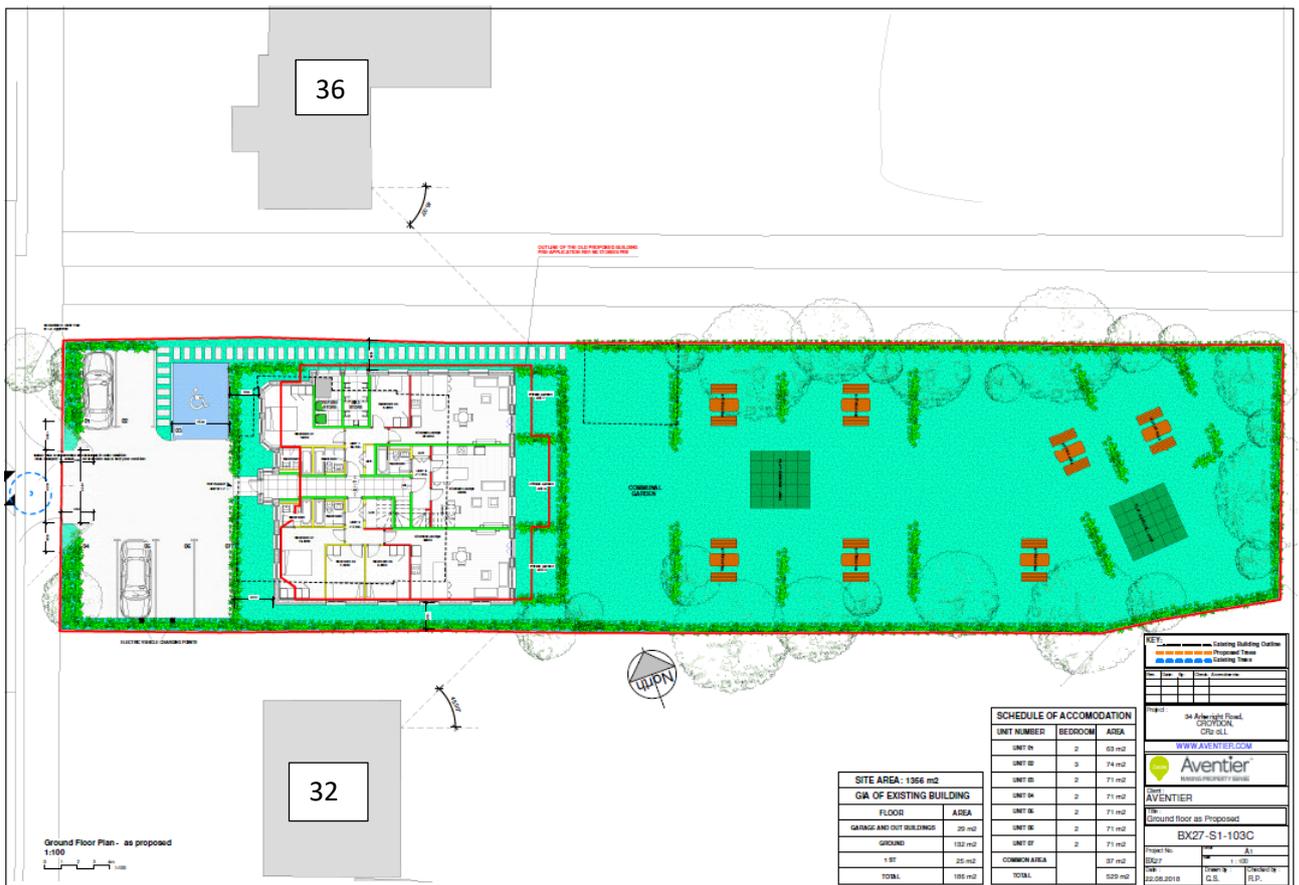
Ground floor plan highlighting the relationship with the adjoining occupiers.
